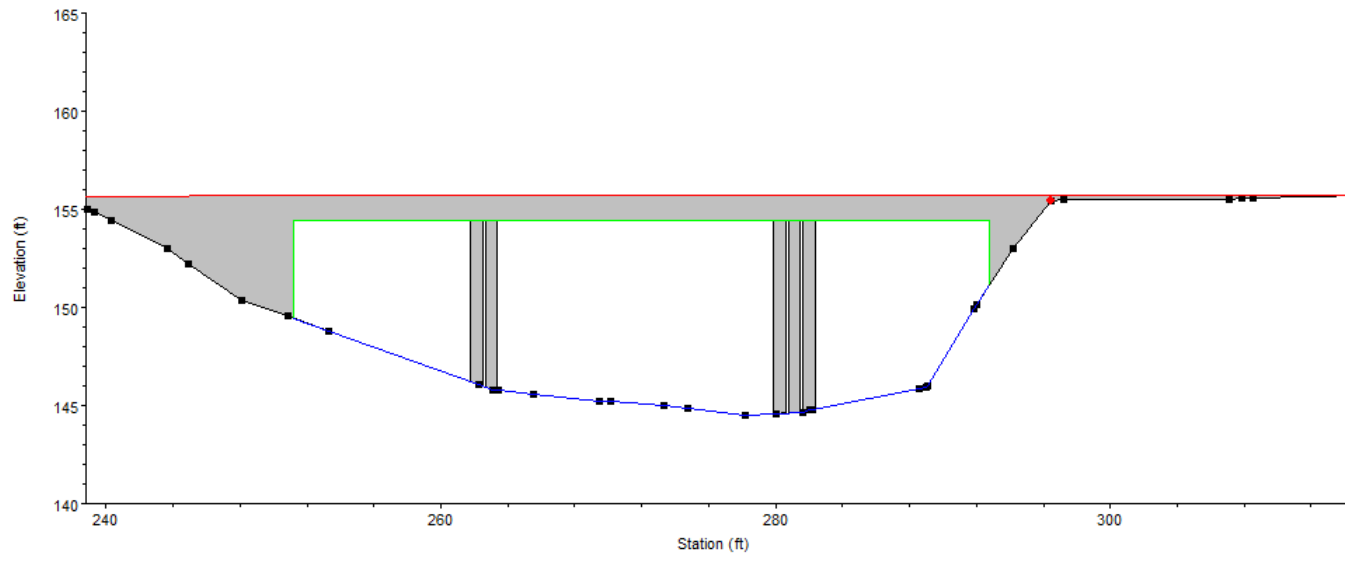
EXISTING CENTRAL STREET BRIDGE AS DEFINED IN RAS
